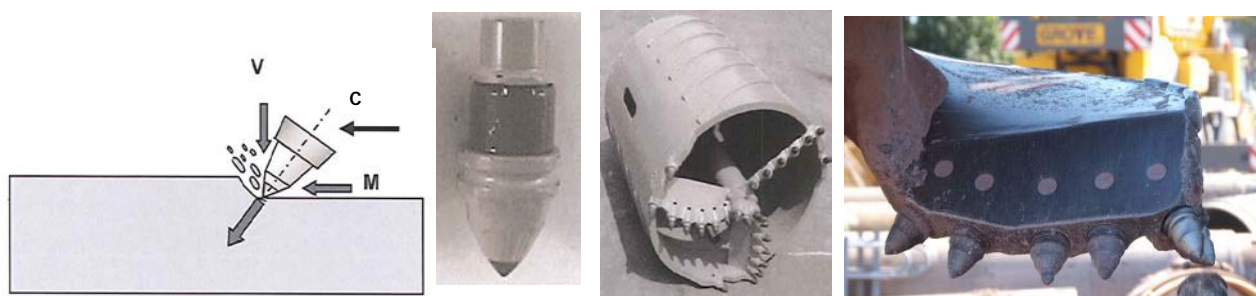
Working principle of a bullet tooth / drag pick (left), typical bullet tooth with tungsten carbide tip (centre left), typical core barrel with cross cutter (centre right), auger starter with bullet teeth (right)
